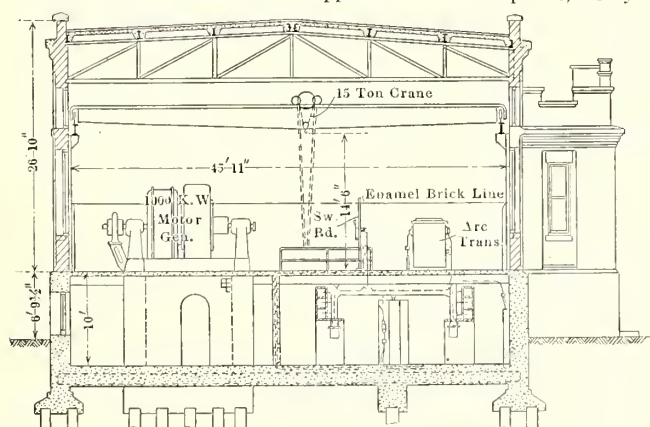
Detroit Tunnel—Cross-Section of Substation Along Line E-E Shown on Plan
